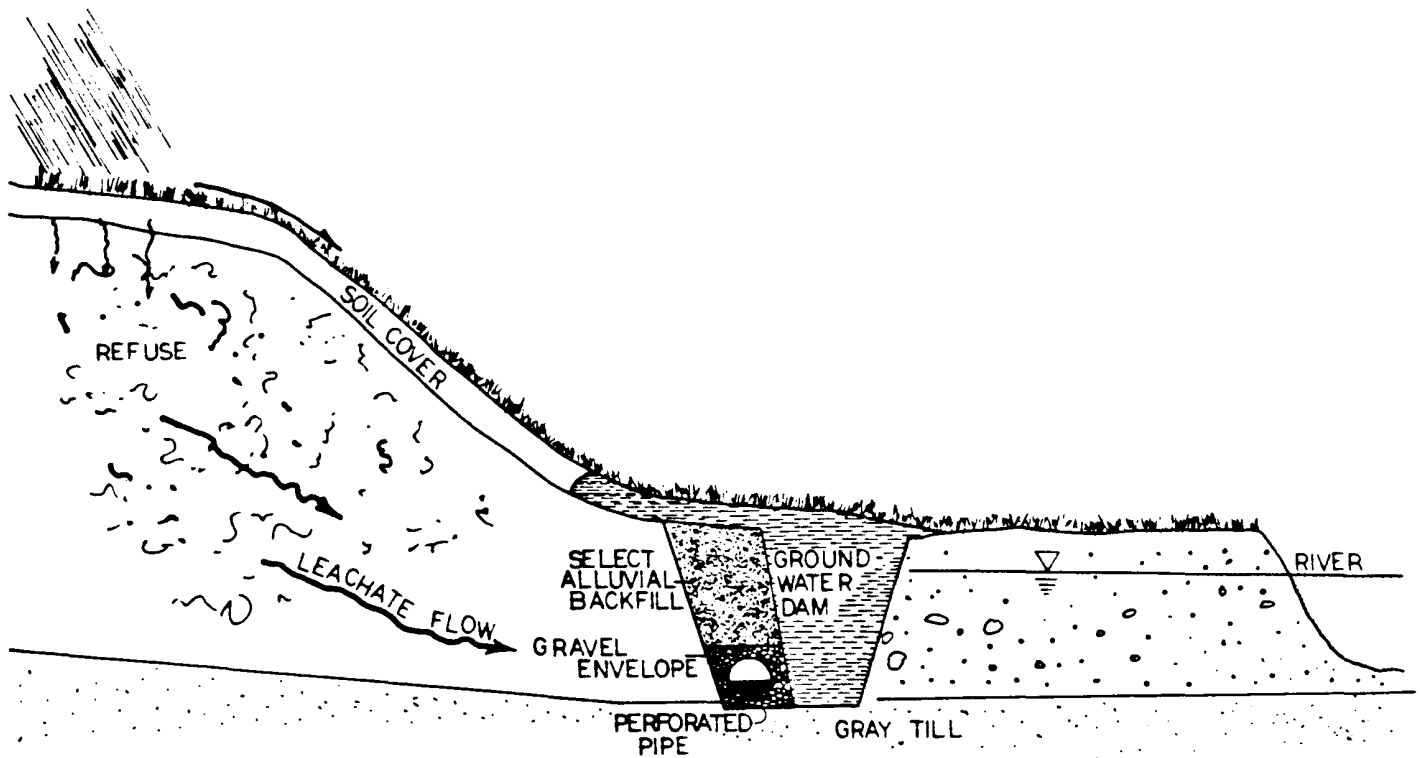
Site cross section of a groundwater dam used to contain leachate at a landfill (Giddings, 1982).
